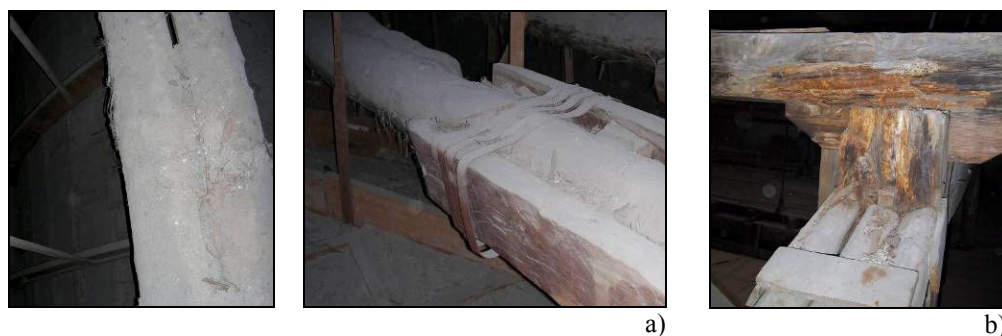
Guard Room (XXIX) – Failure diagnosis: a) Inefficiency of connection of vault supporting beams; b) Biological attacks of truss king post.
